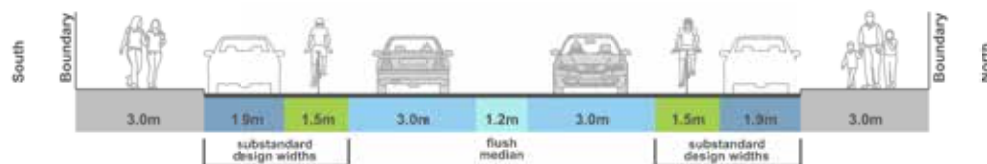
Current Ferry Road corridor generic cross-section showing metres allocated to different transport modes. Note: some sections of Ferry Road are wider than this cross-section and have standard cycle lane and carpark widths.
